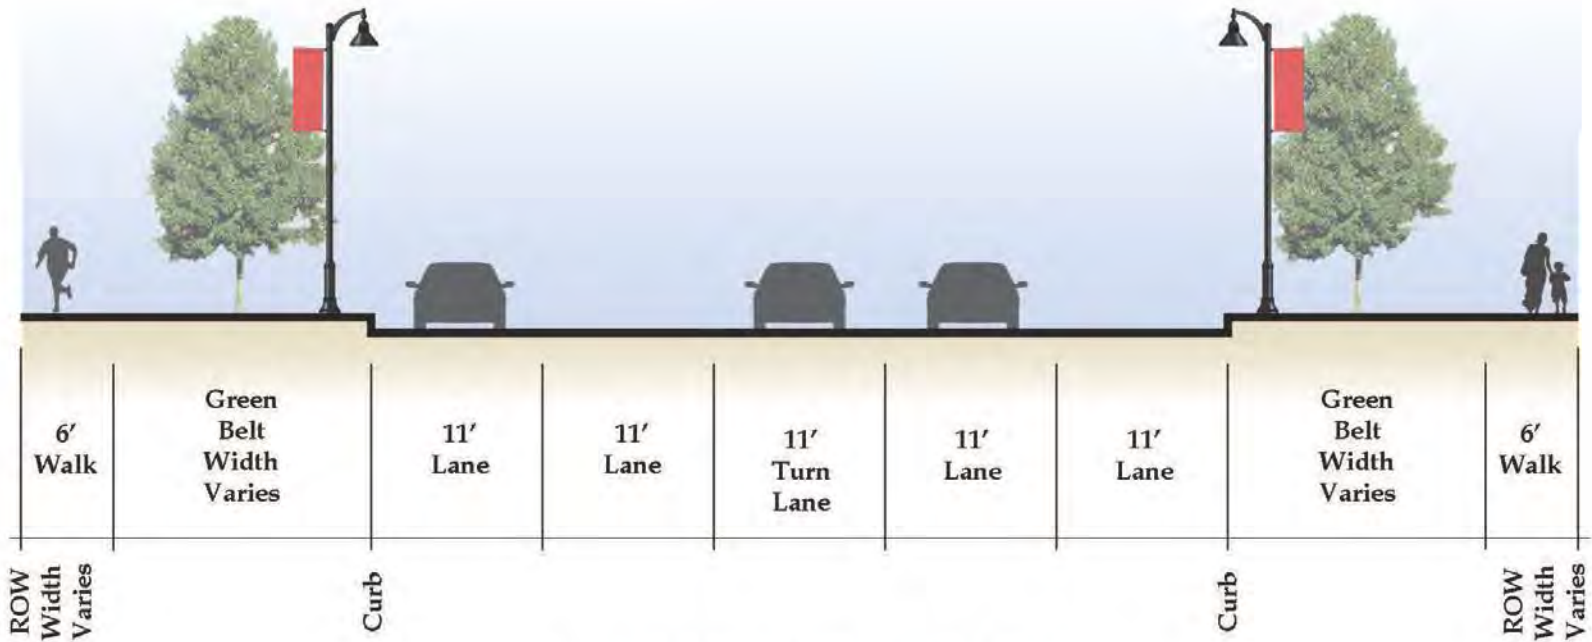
Illustration J. Typical Existing US-10/US-31 Cross Section - Pere Marquette Highway to US-31 Scottville Bypass
